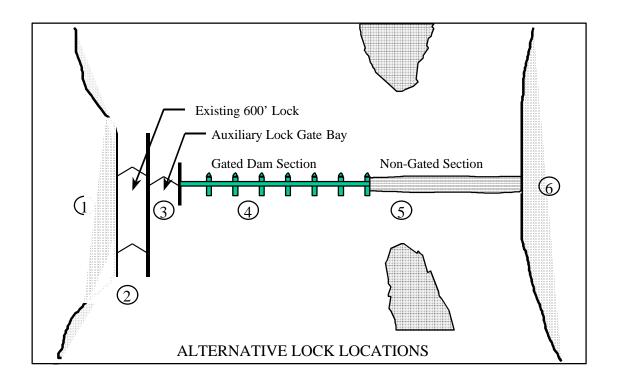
Alternative New Lock Locations at a Typical Existing Lock and Dam Site.
